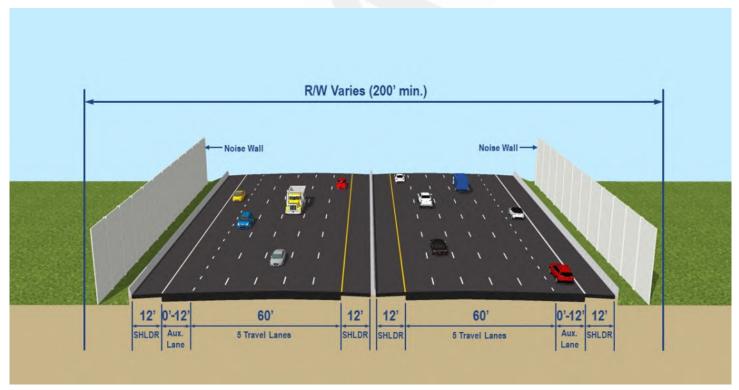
Design Change Alternative (Mainline to General Use Lanes) Typical Section
